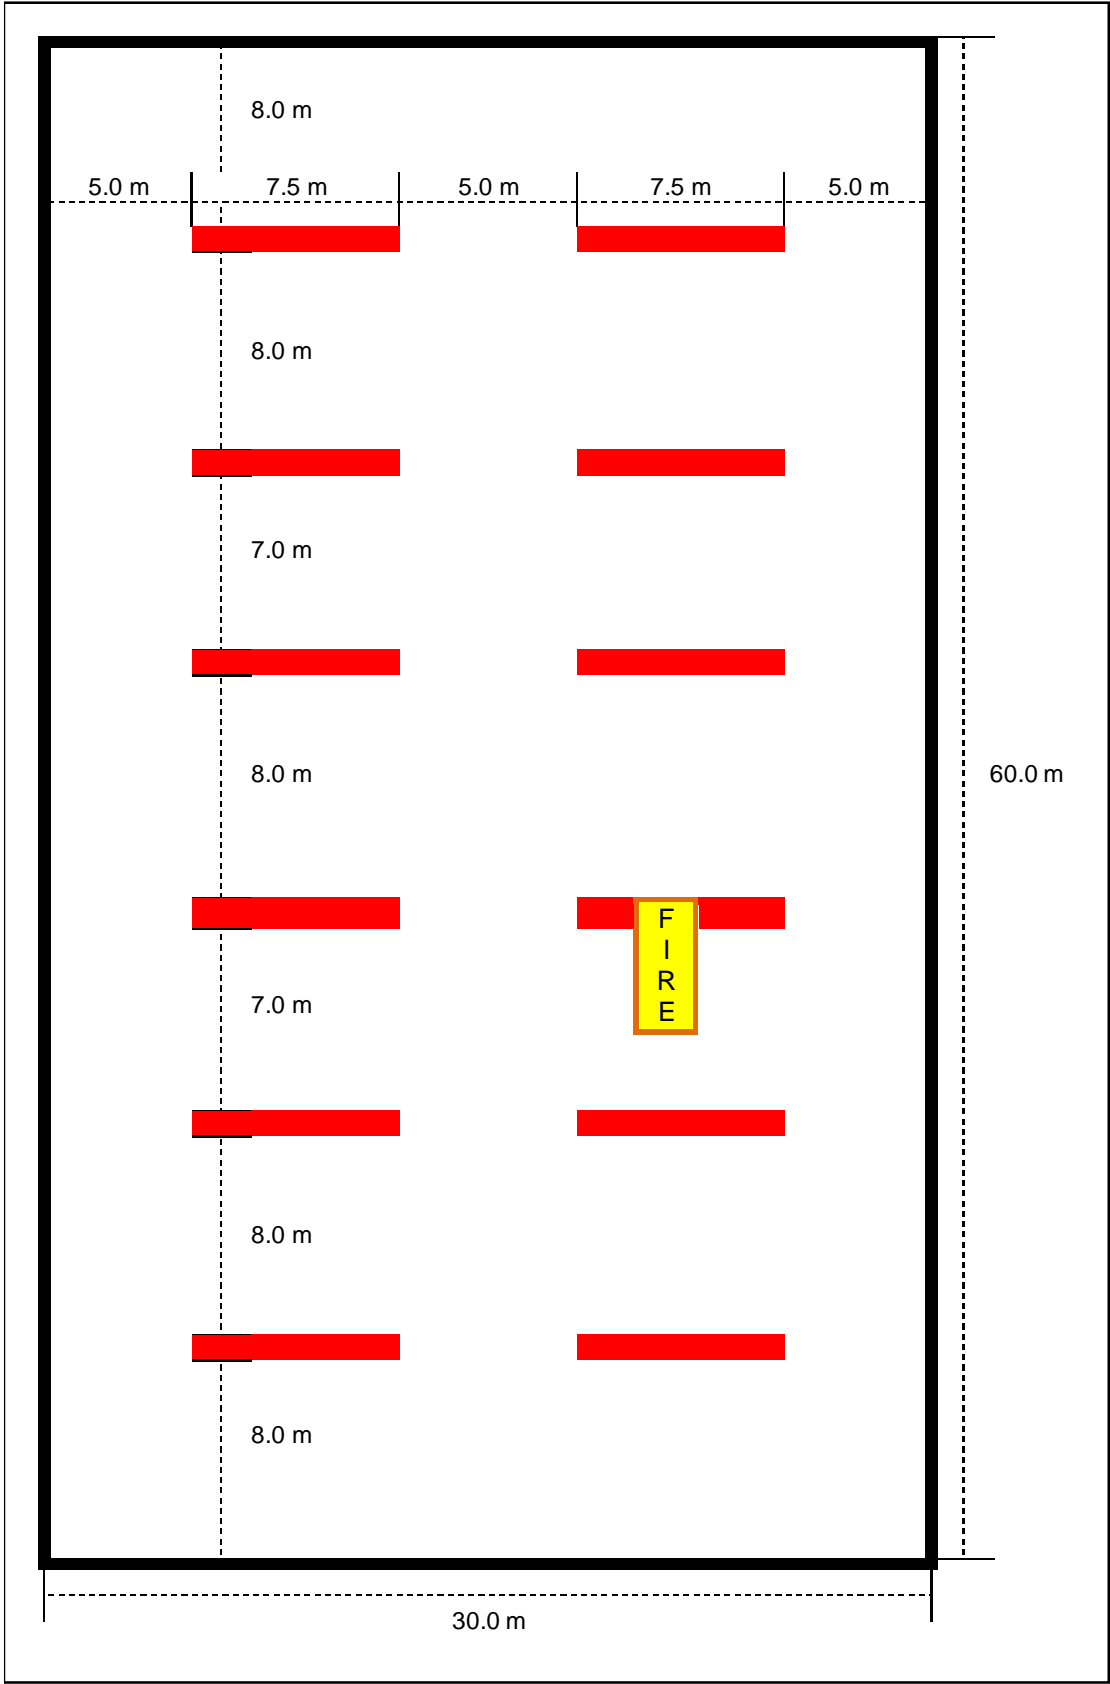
Plan view of small warehouse showing position of strip-shaped vents.
